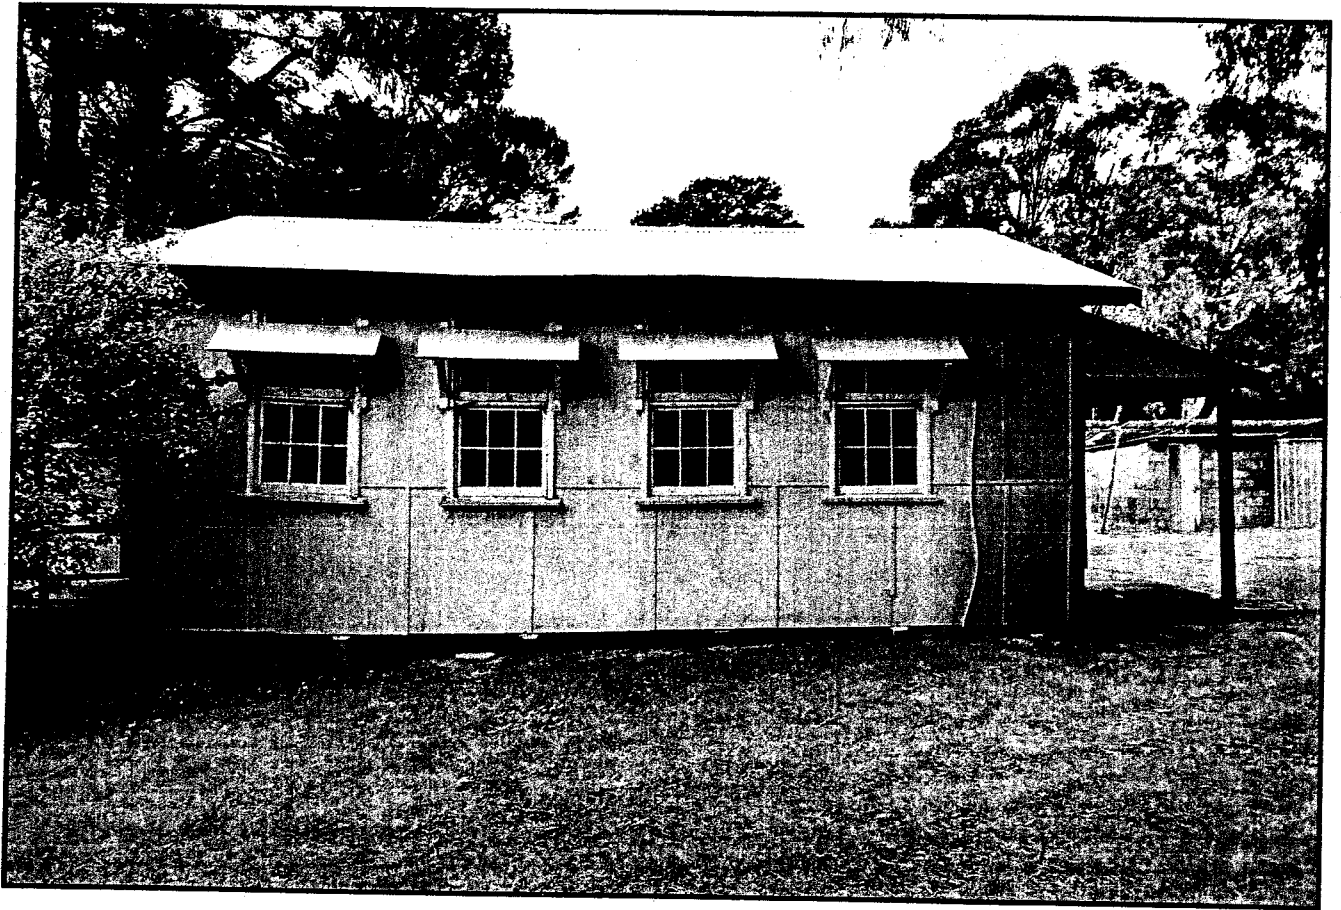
General view of side elevation; note distortion of ridge, gutter and window sill line due to differential settlement of stumps
